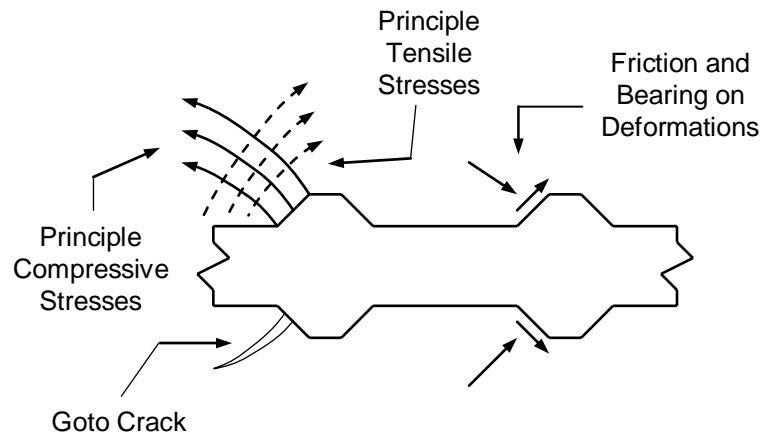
Formation of Goto cracks (adapted from ACI 408)
